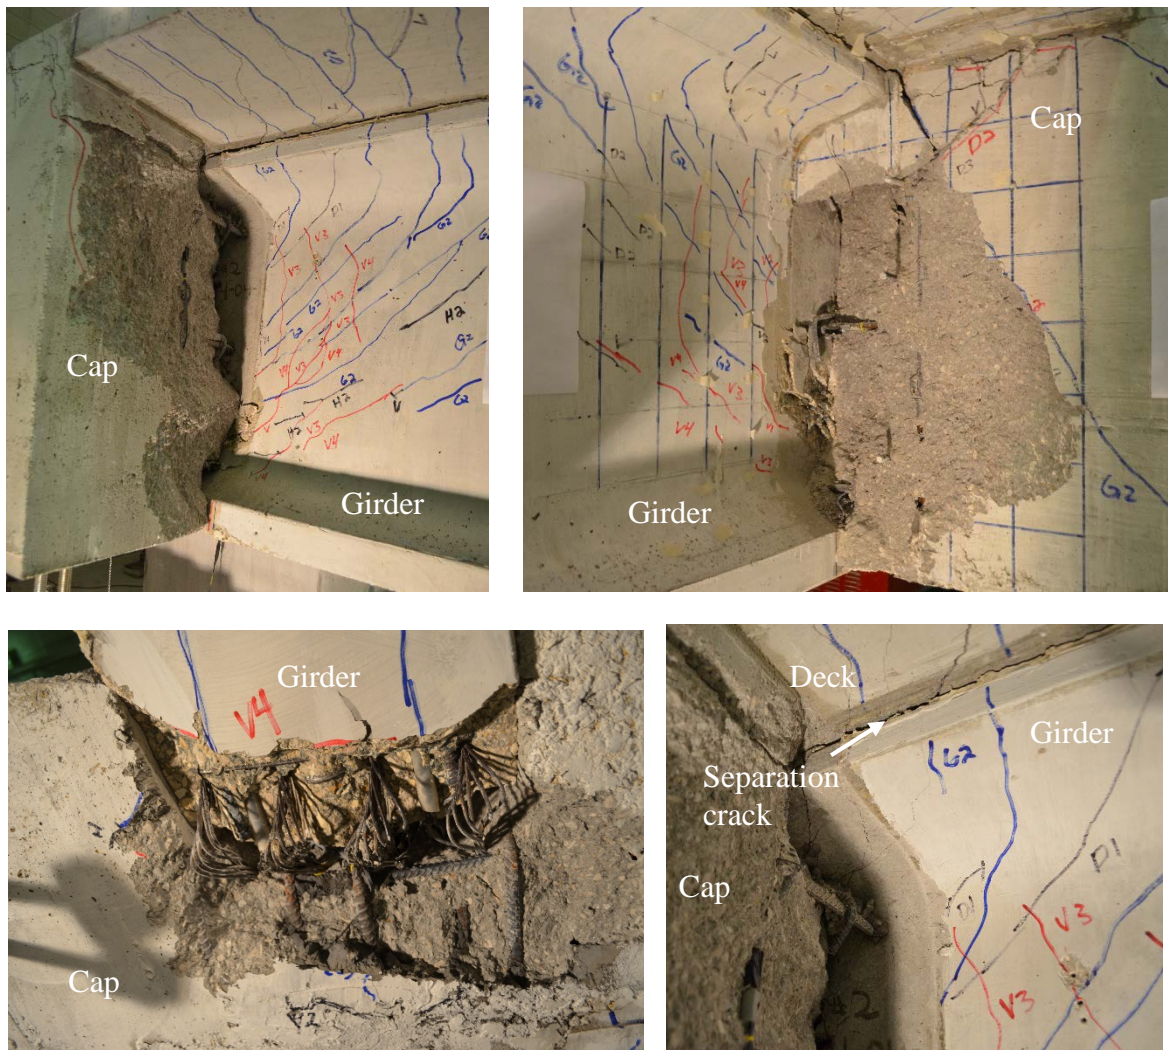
Final condition of connection region (upper - cap adjacent to girder; lower left – underside of girder to cap connection; lower right – separation of girder from deck)
